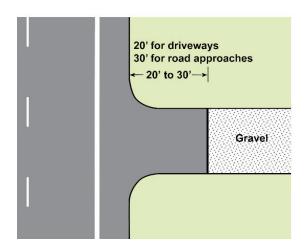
Gravel driveway paved to limit gravel on shoulders
